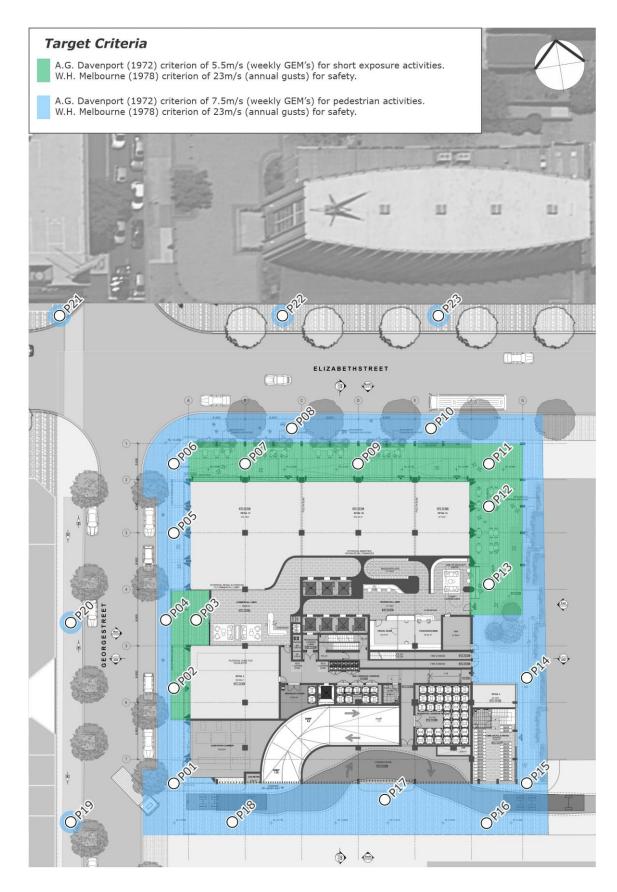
Study Point Locations and Target Wind Speed Criteria – Ground Floor Plan
